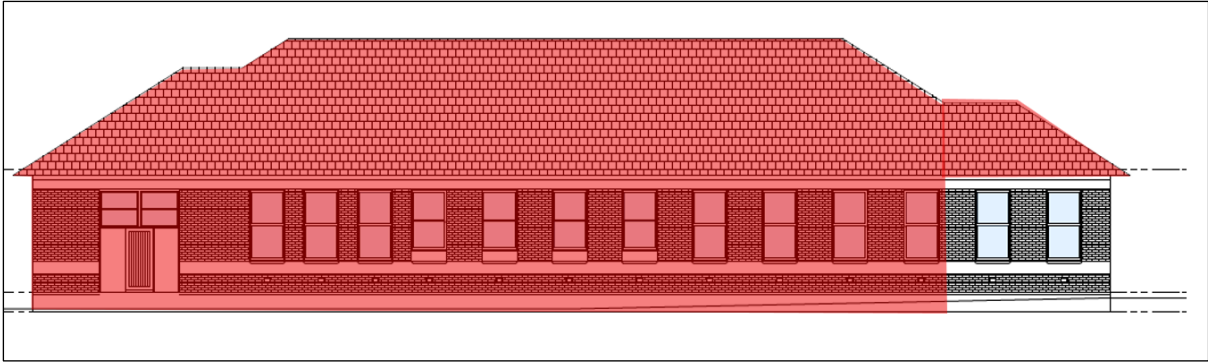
Main Building east elevation at completion of proposed works (Source: Architectus drawing AR-3.30000).
